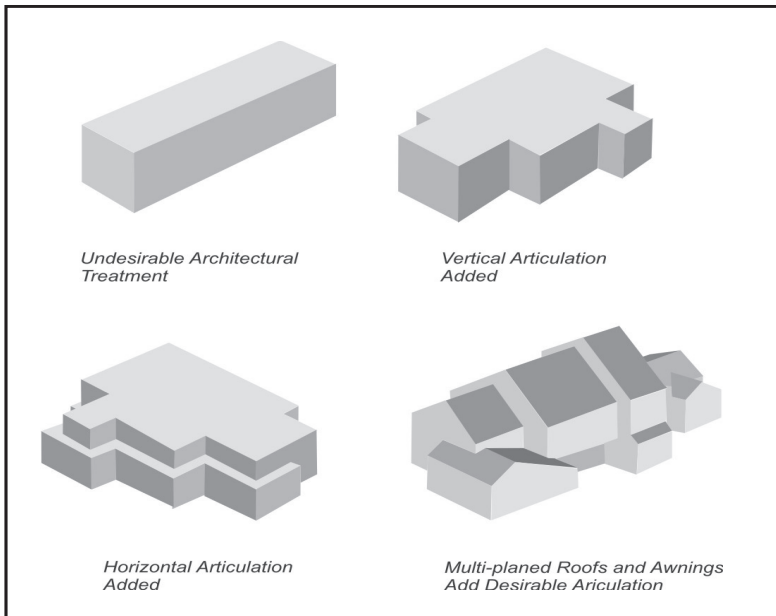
Break up the apparent mass of buildings with vertical and horizontal articulation
